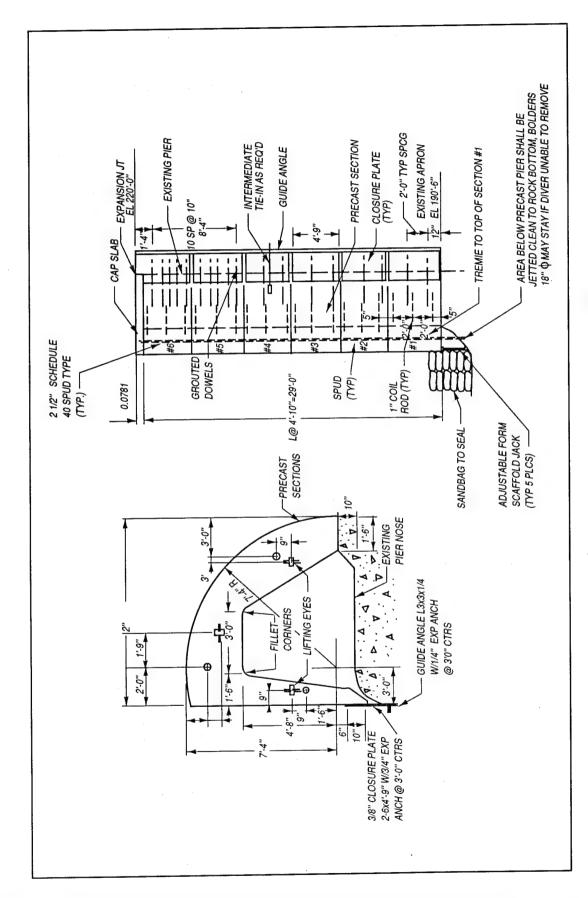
Plan and section view of precast pier nose, Vischer Ferry Dam (after Sumner 1993)
